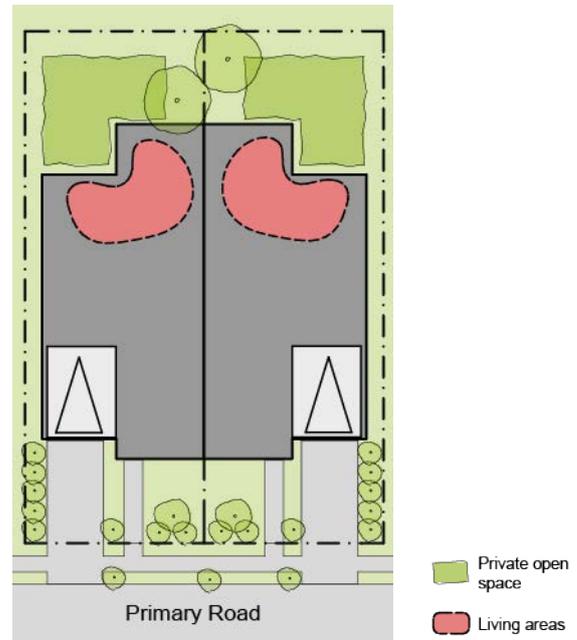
Semi-detached or two dwelling houses can be approved under a DA or CDC
